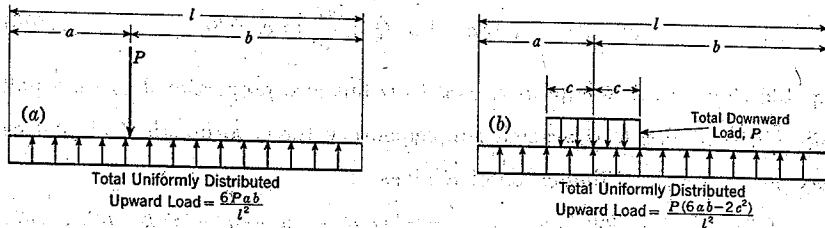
TWO EXAMPLES OF ORTHOSTATIC LOADS ON SUSPENSION BRIDGE
